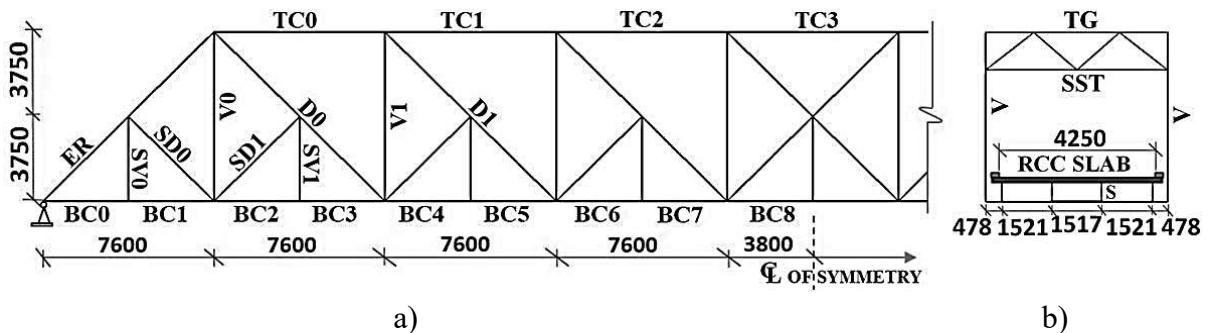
a) Side elevation and b) front elevation view of the bridge
